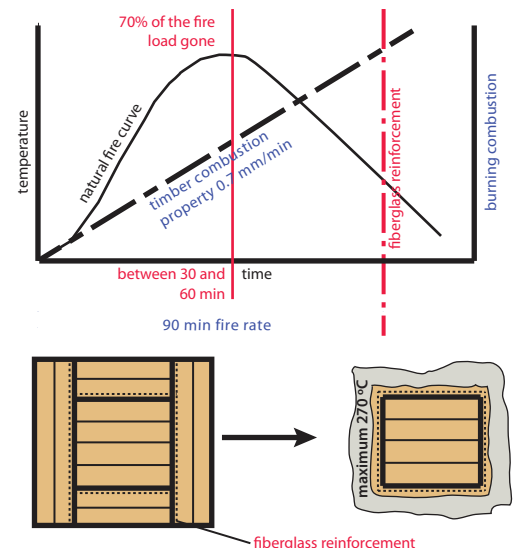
Double-layered timber column, with the structural core inside and a sacrificial layer outside, providing additional load capacity under “normal” use.
